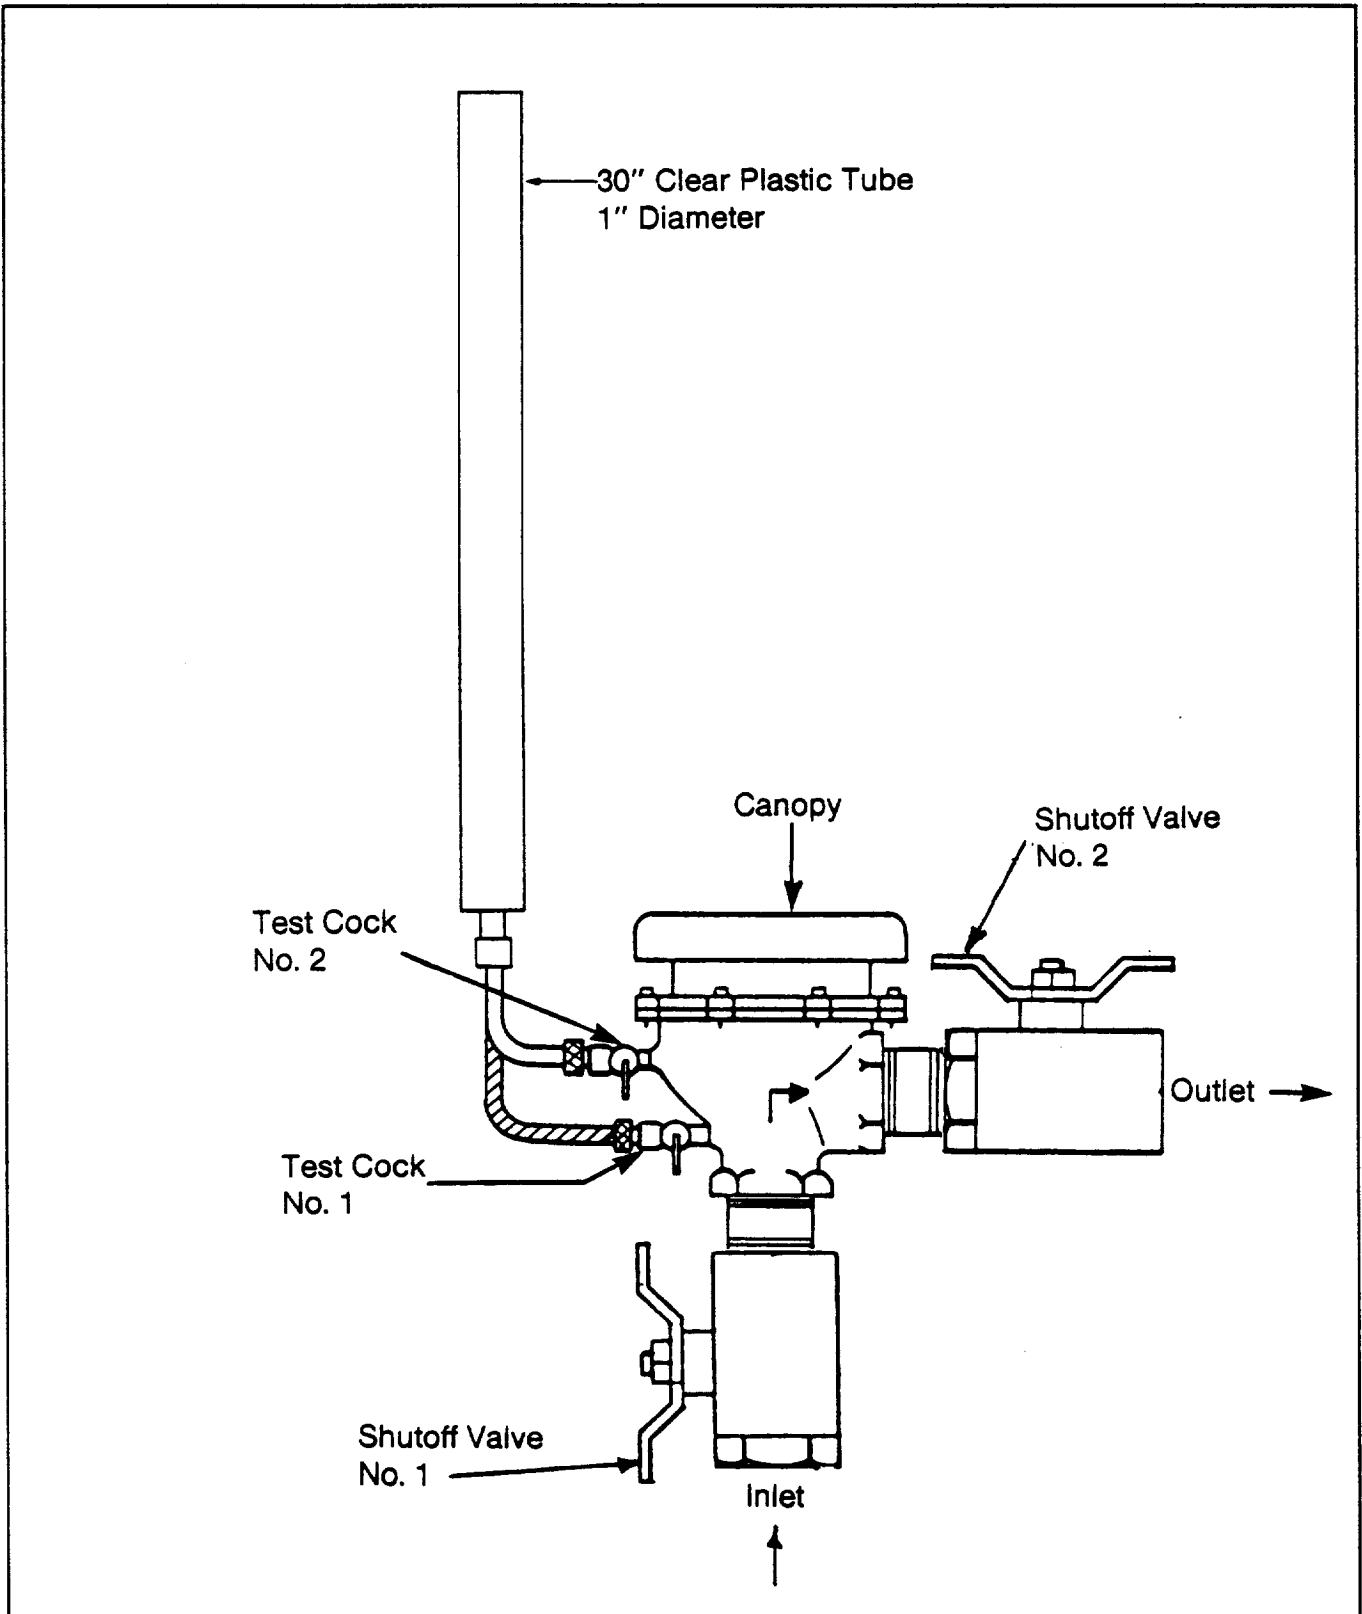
Setup For Testing Pressure Vacuum Breaker Assembly Using Sight Tube.
